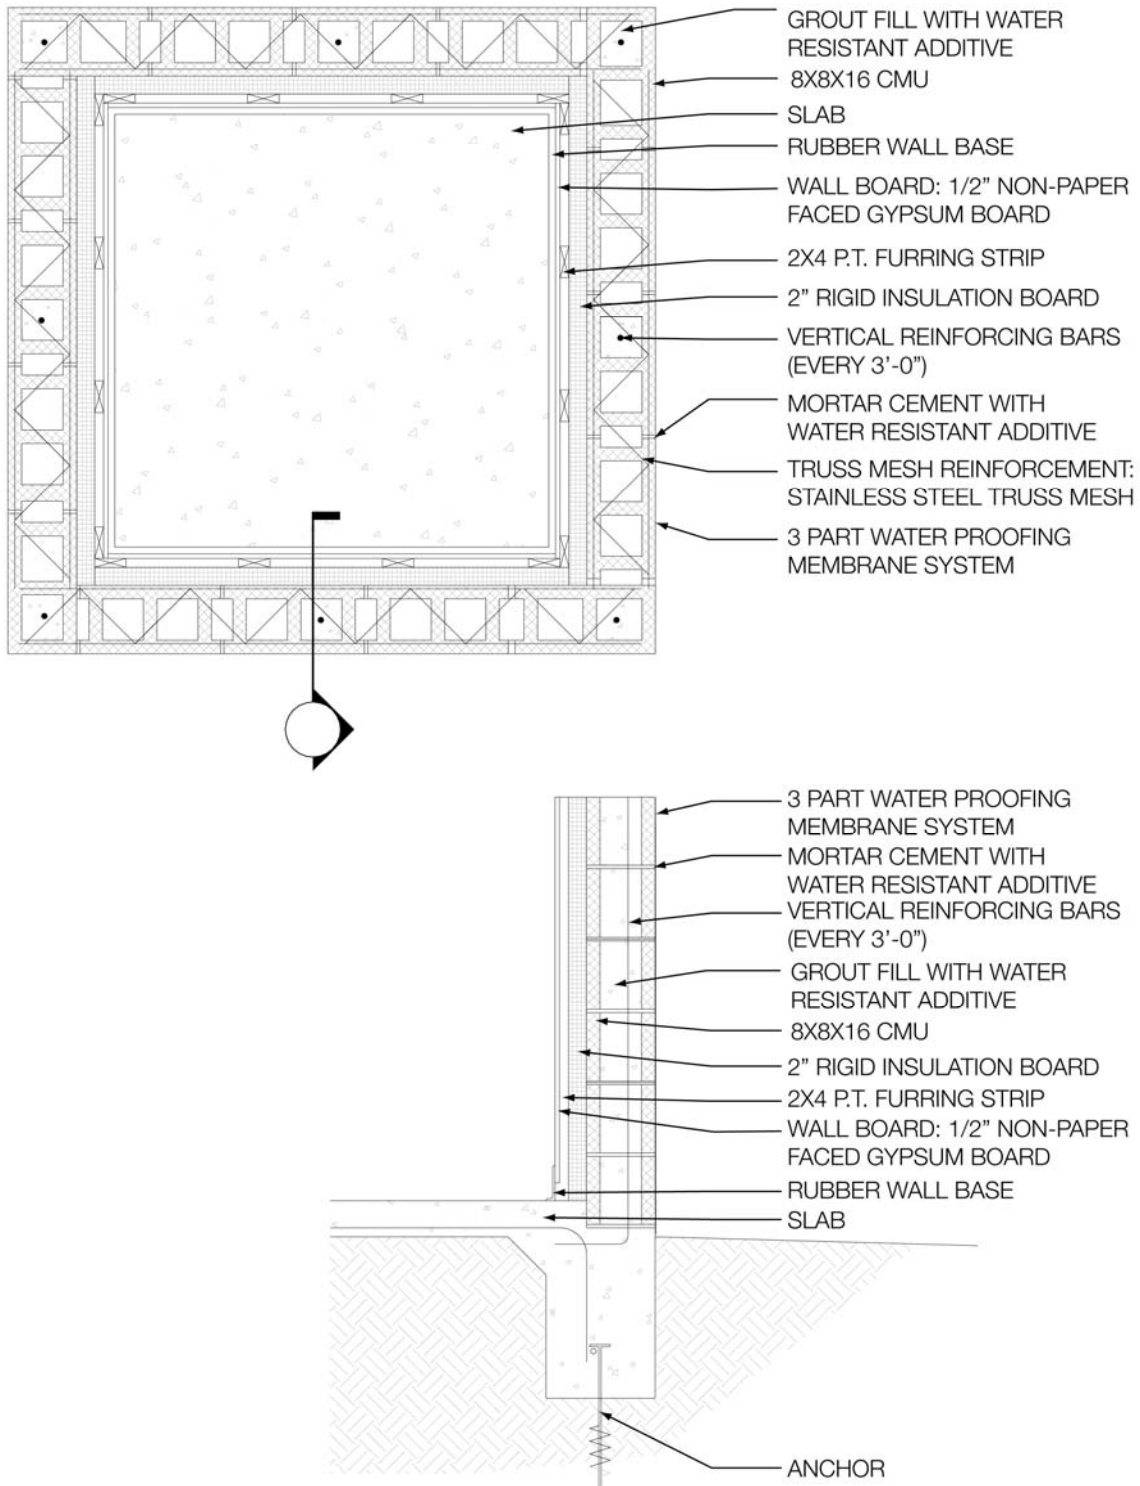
DIAGRAM: Detailed drawings, test pod A: sealed block.
